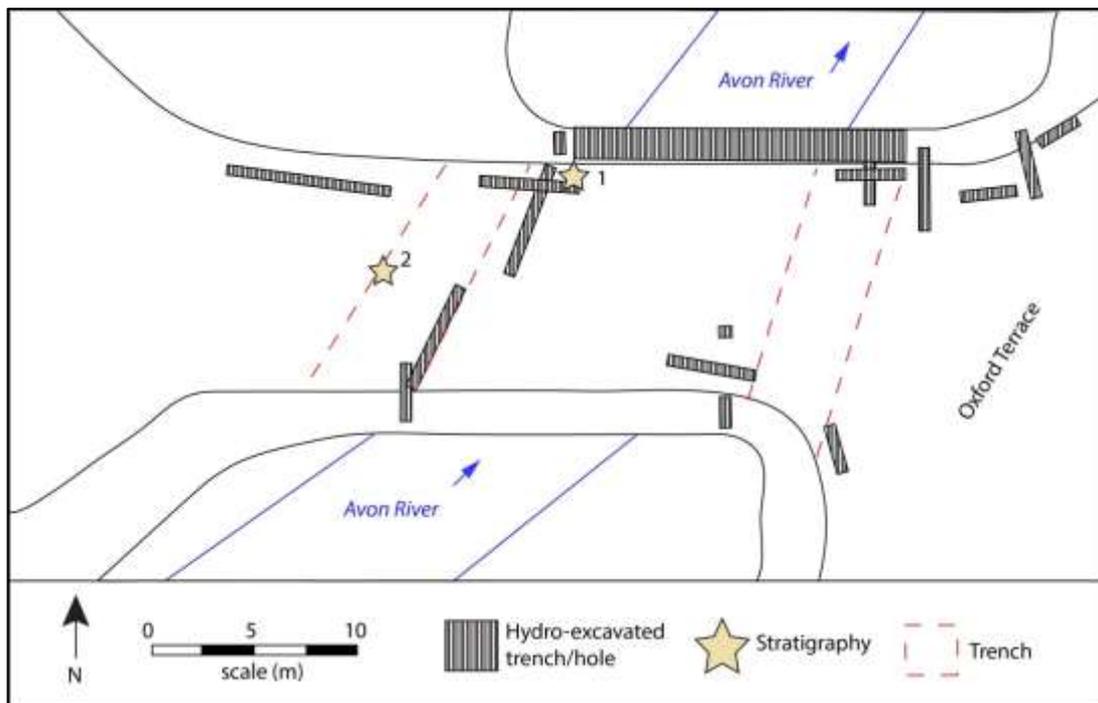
Plan showing the location of the monitored or inspected hydro-excavated holes and mechanically excavated trenches.
